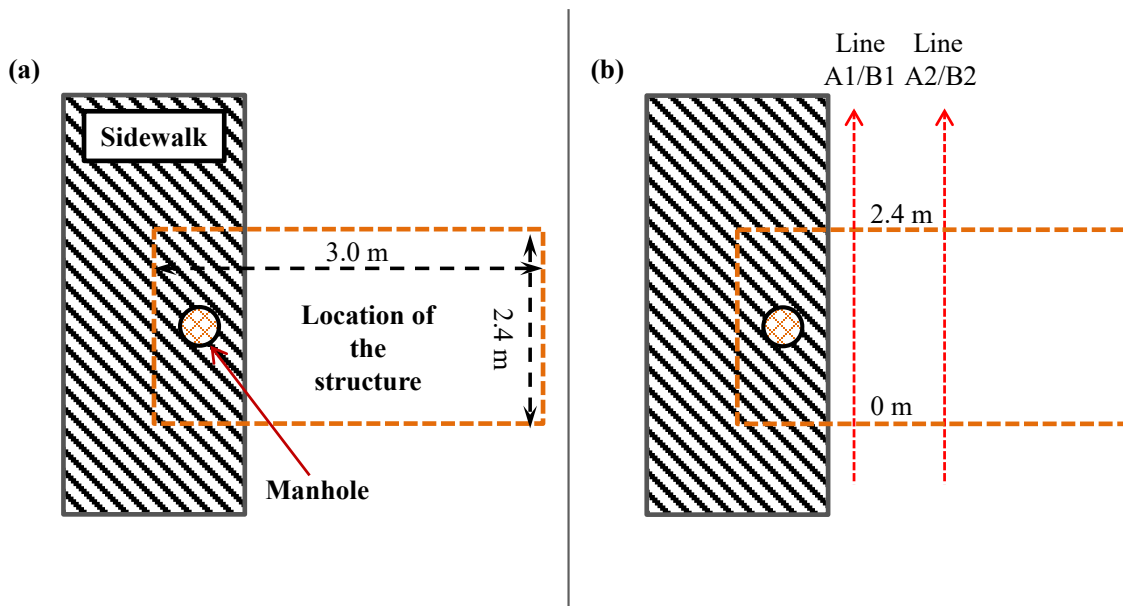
(a) Top view showing the location and dimensions of the concrete structure, the manhole and the sidewalk (concrete slab). (b) Location of the different test lines performed over the structure A and B. The lines pass over the structure between the position 0 and 2.4 m. The distance between the lines A1/B1 and the sidewalk is 0.1 m while the lines A2/B2 are 0.65 m away from the sidewalk.
